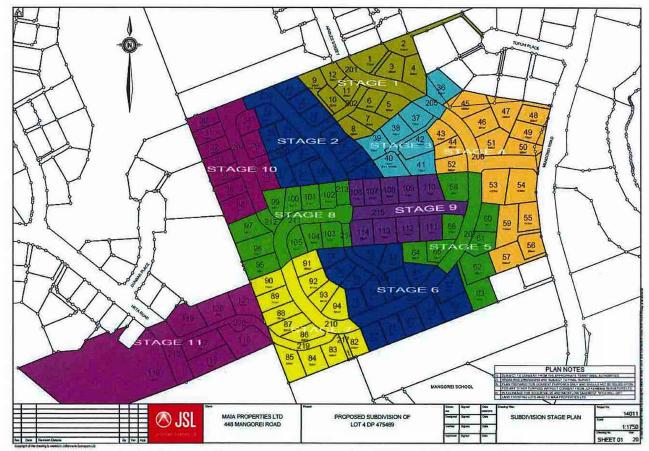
Proposed Subdivision (Source: Application for SUB18/47083, Revision 20)
